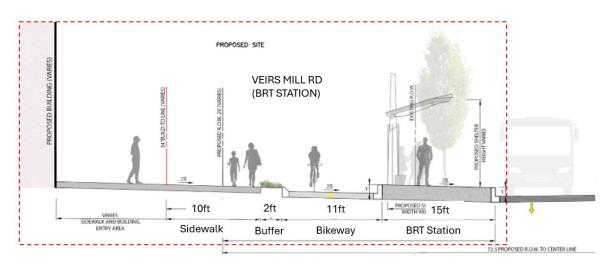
Veirs Mill Road frontage improvements along planned BRT Station, looking north
